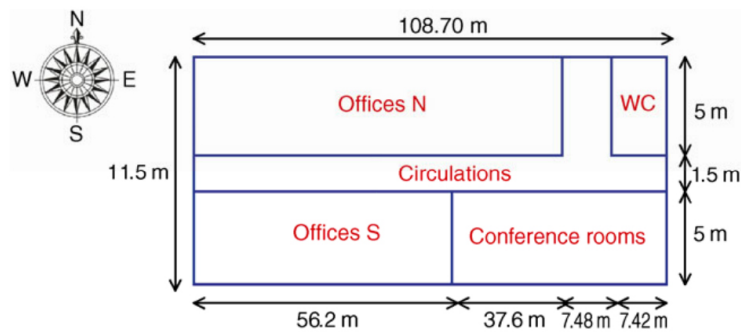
Office building floor geometry (Stabat *et al.*, 2011)
